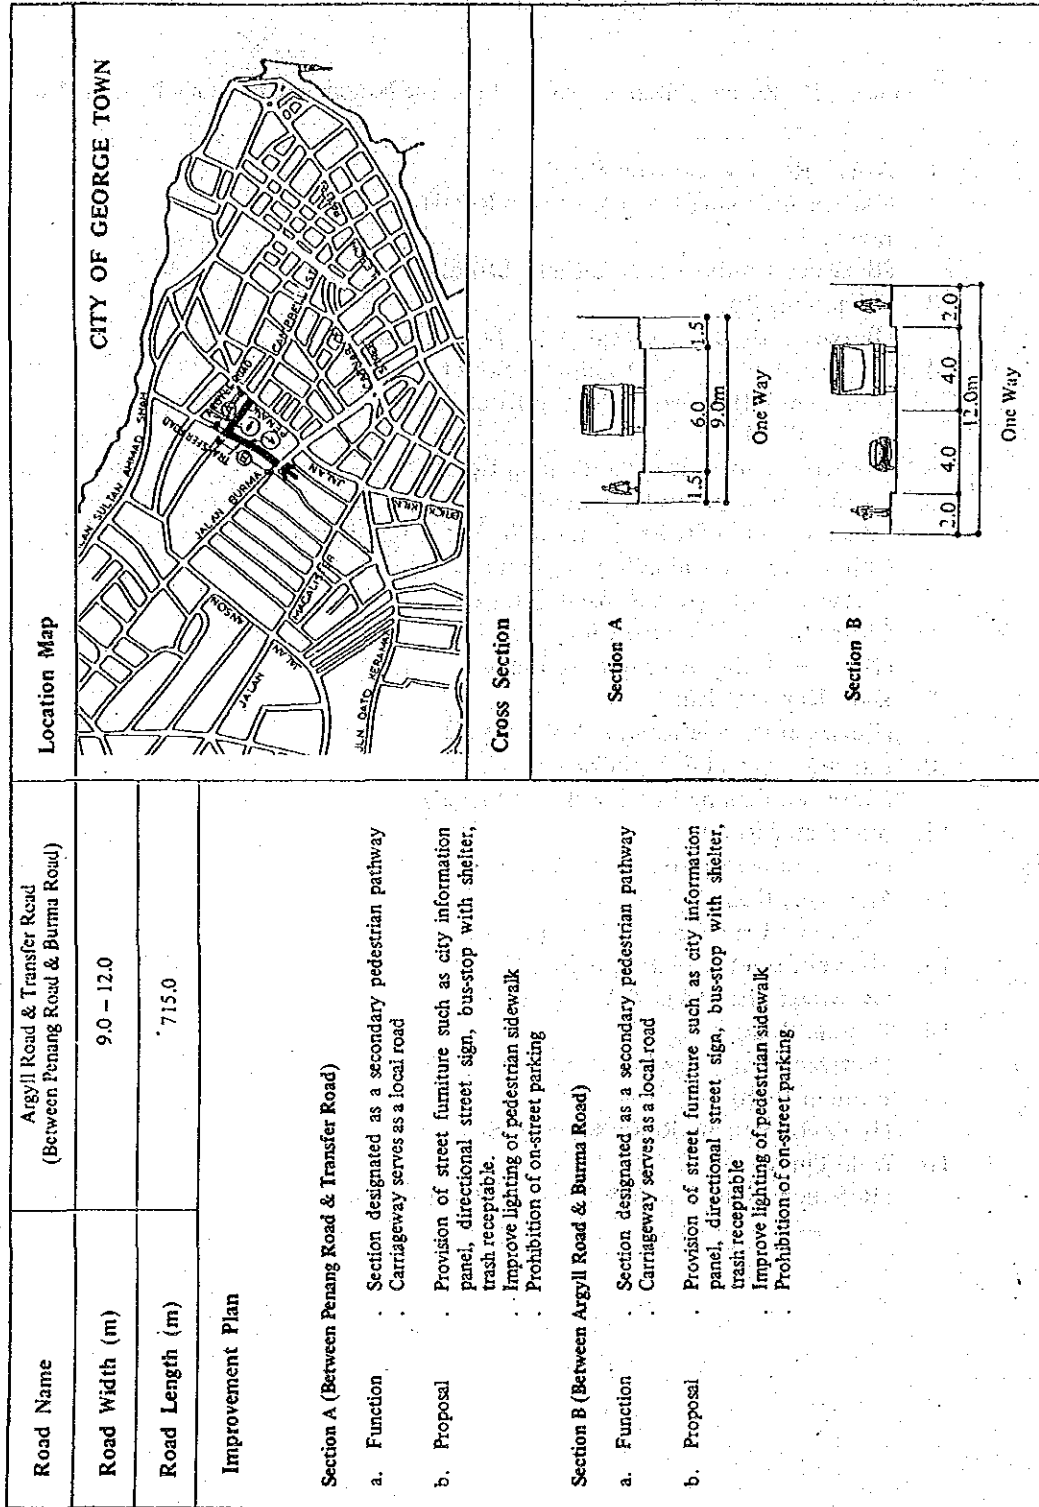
Pedestrianisation Improvement Plan (1) – Argyll Road & Transfer Road
